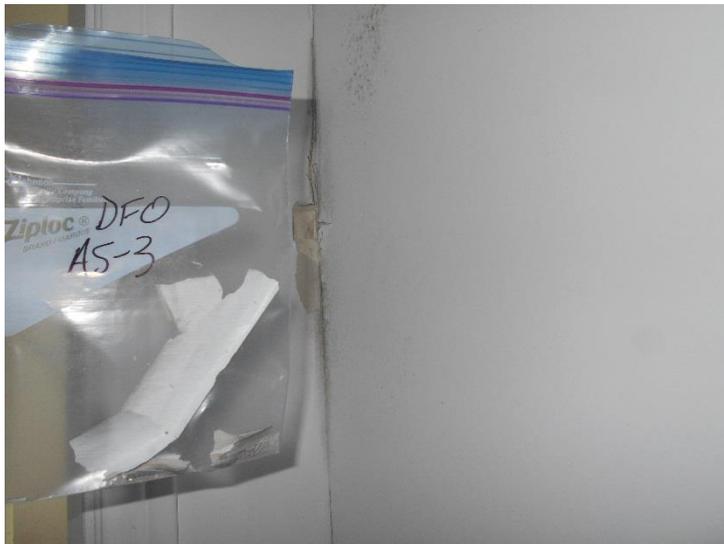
View of bulk sample CA-AS-3 (drywall joint compound).
